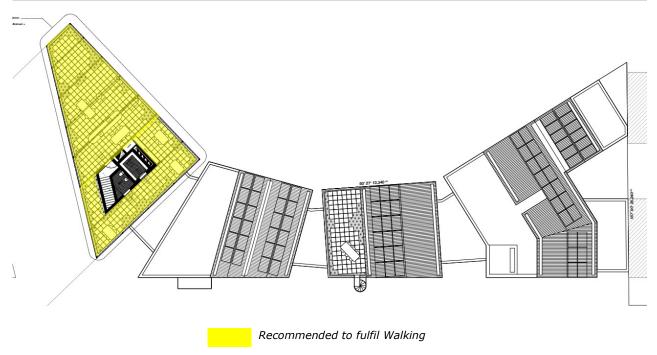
Level 8 plan with recommended wind criteria overlaid.
